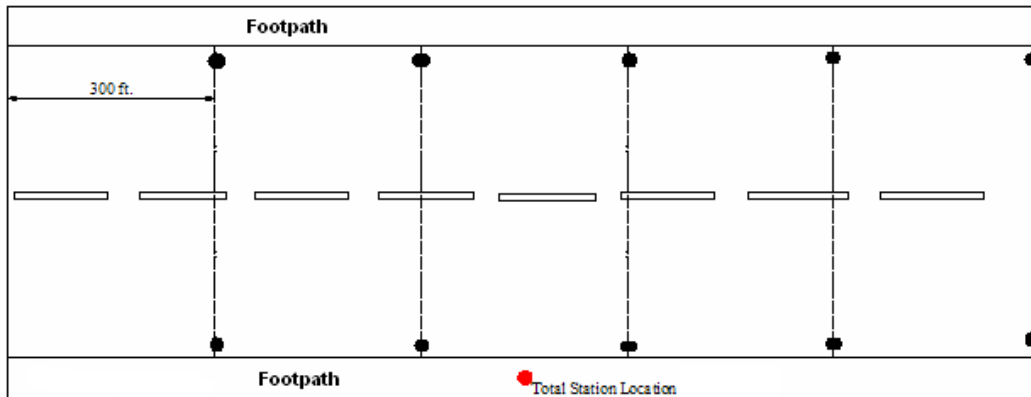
Plan Views of Elevation Survey Points at Southeast Parkway – East Bound
